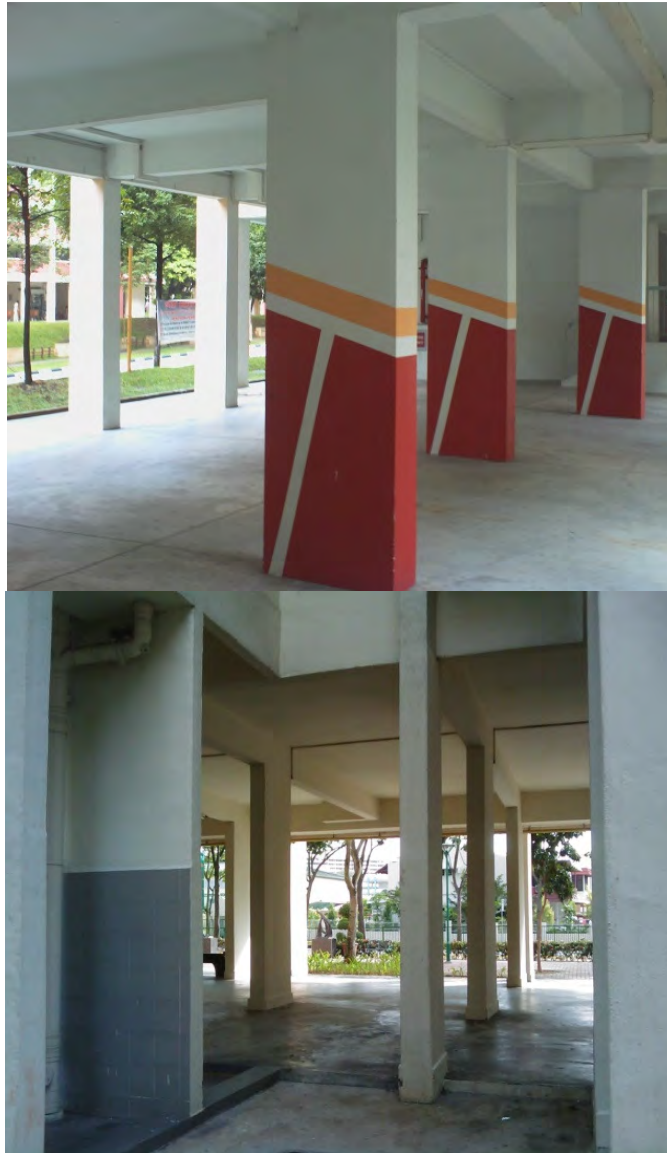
Void deck on the ground floor of typical Singapore's apartment blocks
